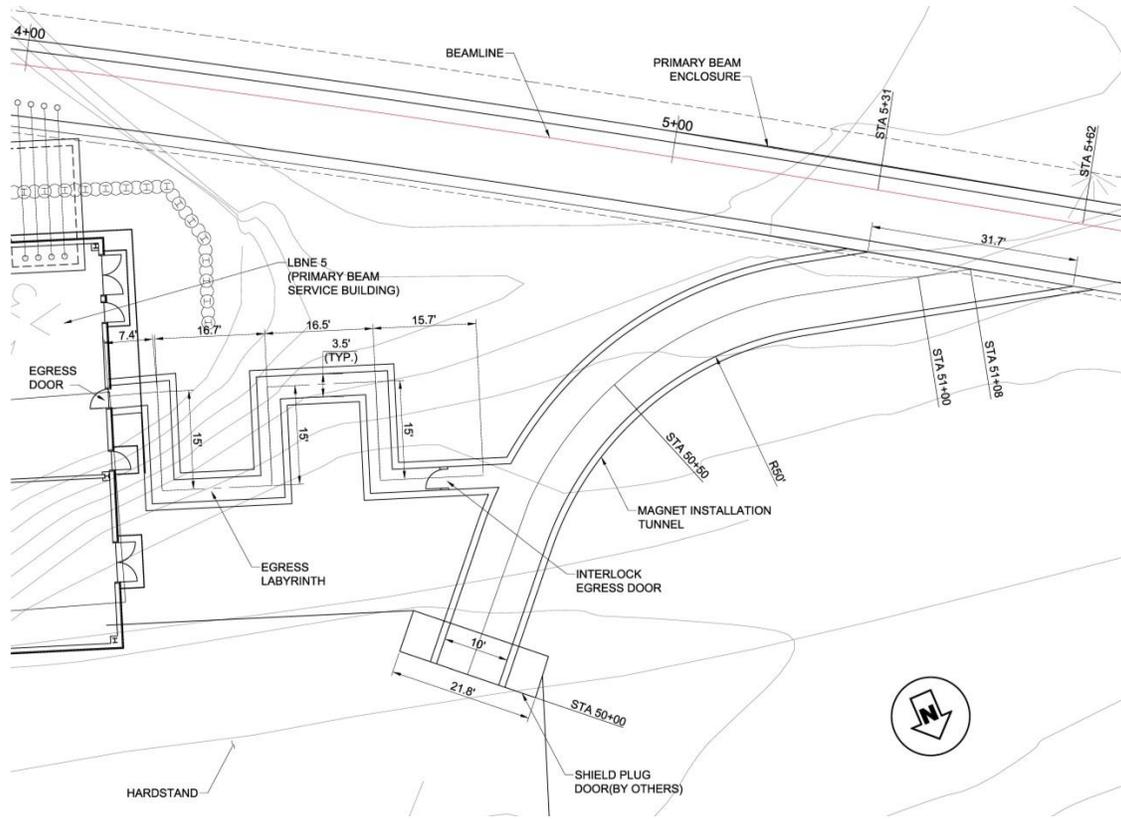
Primary Beam Service Building (LBNE 5) Egress Labyrinth.
